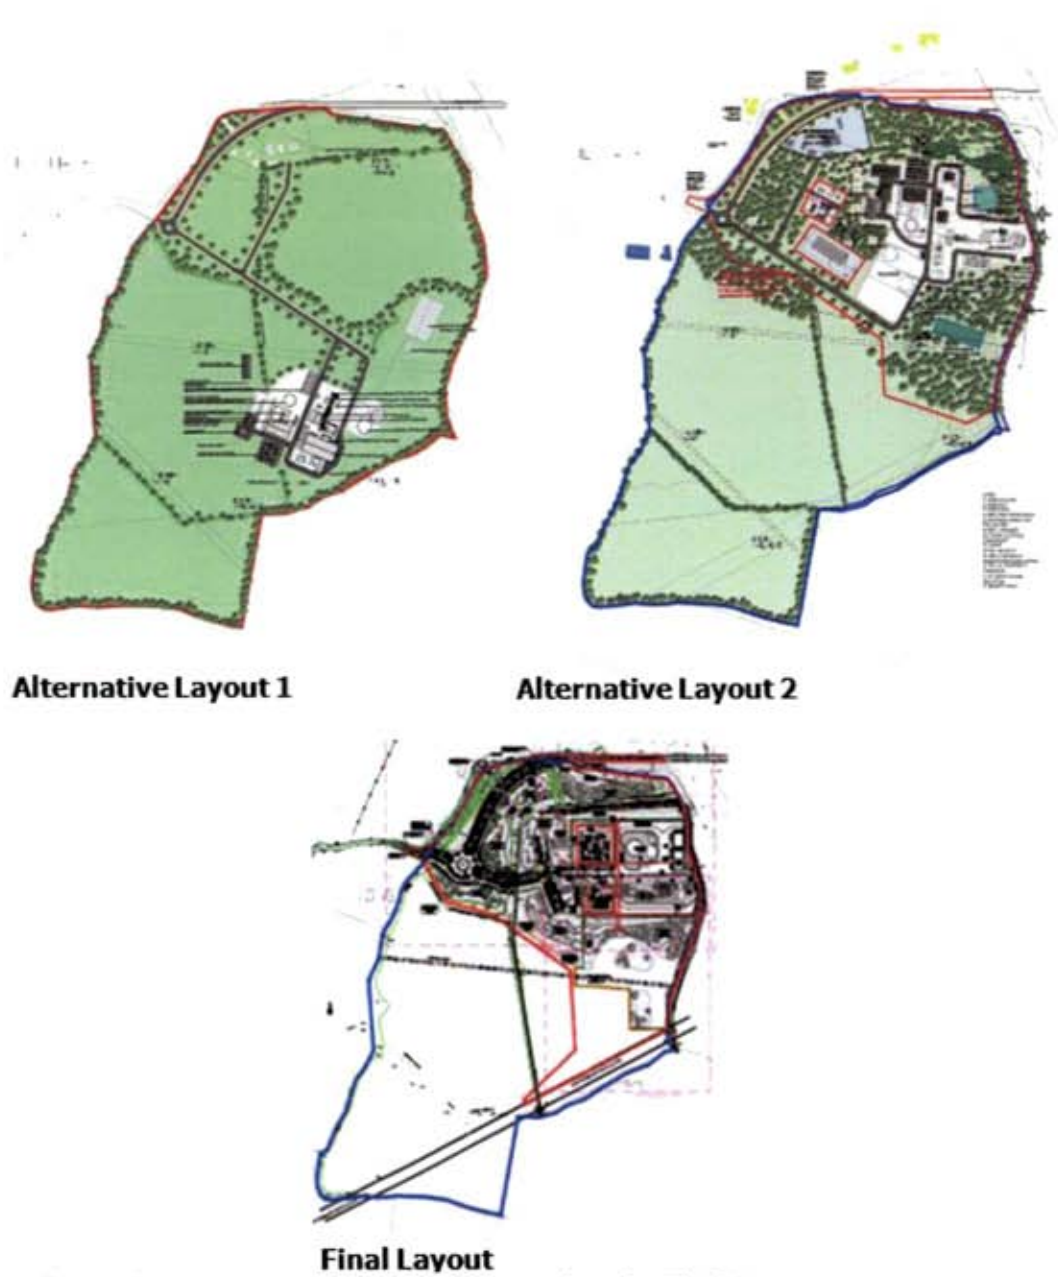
Alternative Layout options 1, 2 compared to the Final Layout
